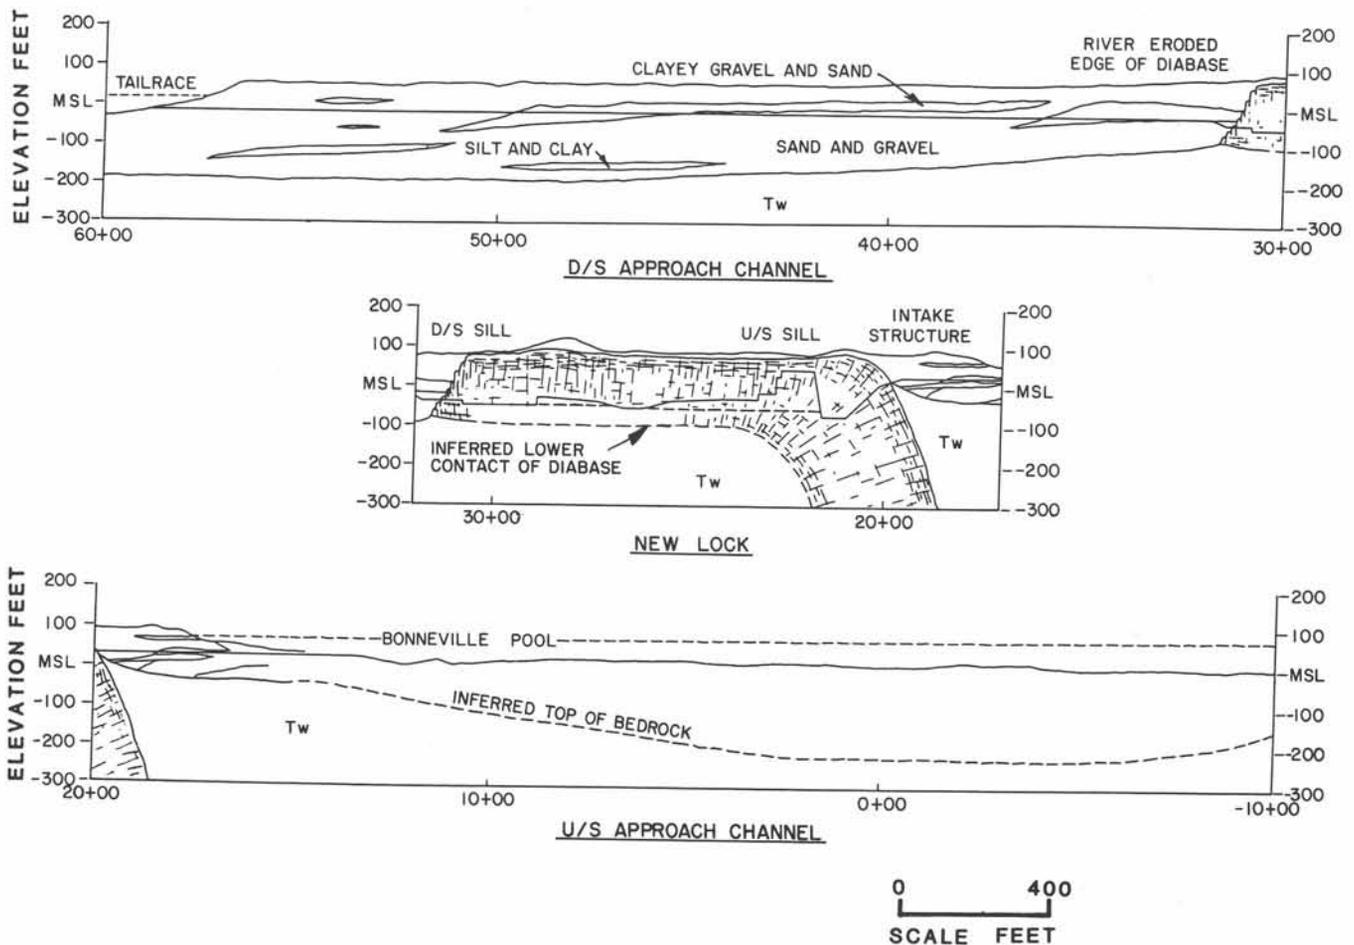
Geologic sections through the new navigation lock area, Bonneville Dam. Views to the north, to the Washington shore. Courtesy of U.S. Army Corps of Engineers.
